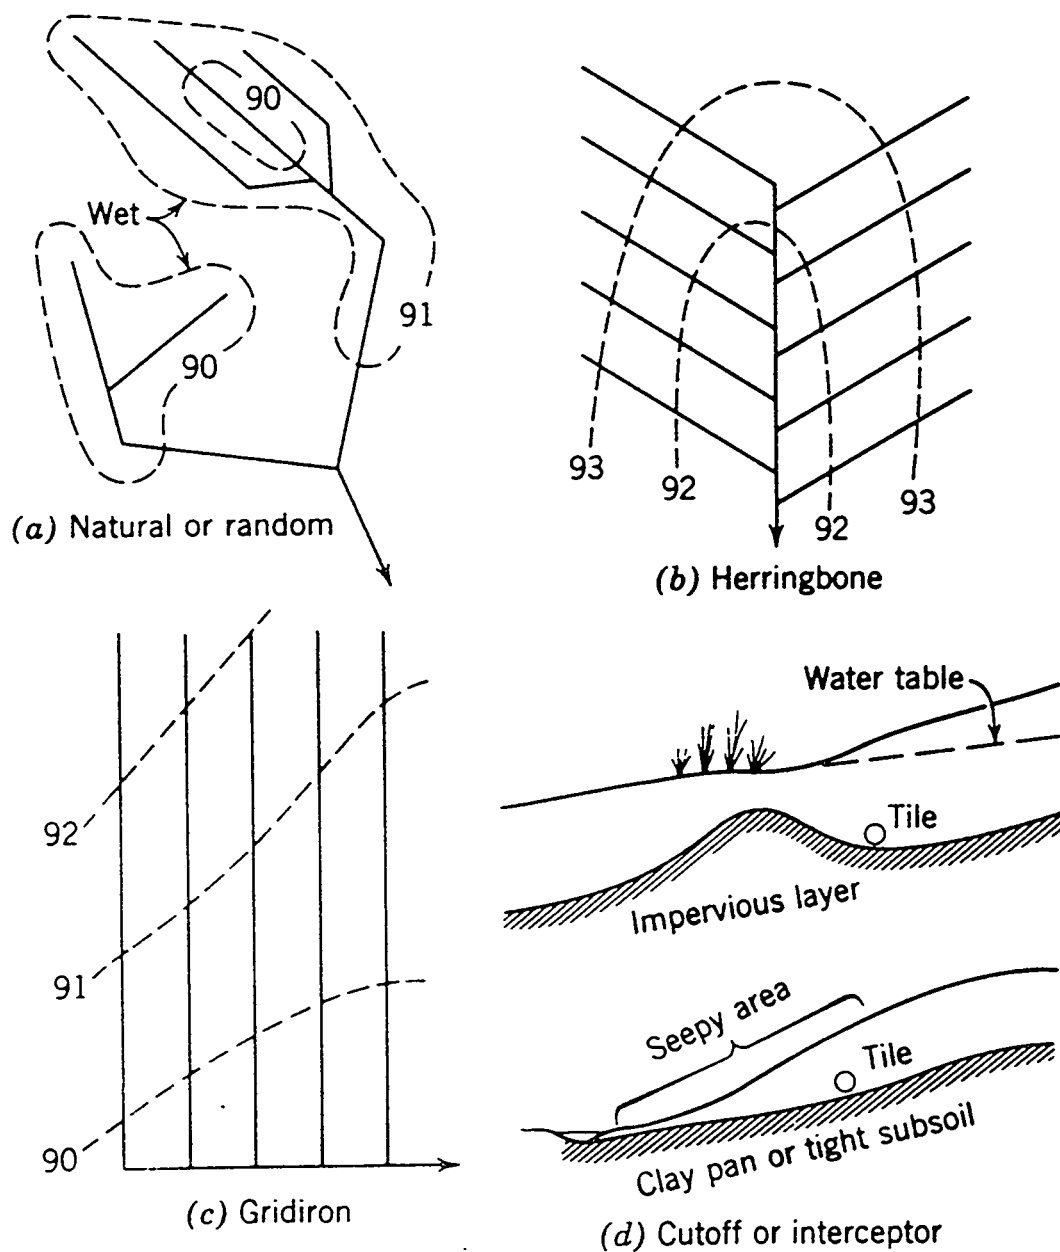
Common types of tube drainage systems. Source: G. O. Schwab et al., 1981, Soil and Water Conservation Engineering, 3d ed., p. 321, Wiley, New York.
